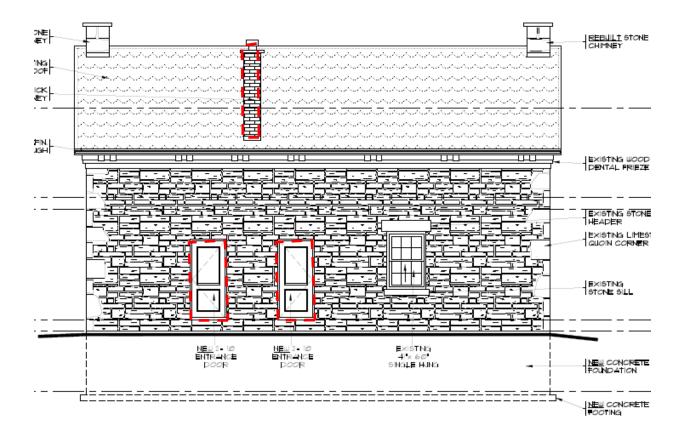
Detail of rear elevation noting two person doors and chimney which should be removed (Source: Reid's Heritage Homes, 2023)
